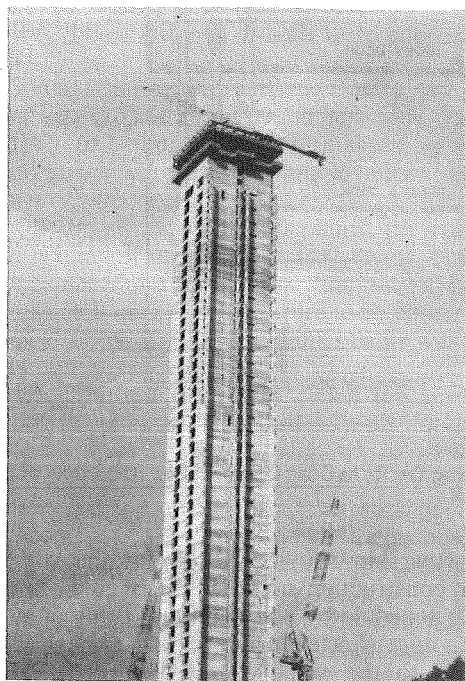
Overview of Concrete Core and Steel Framing in IBM Tower
